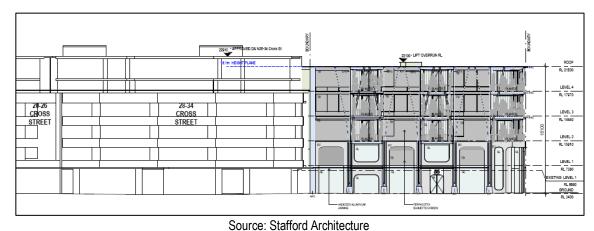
Streetscape Elevation Showing Relationship to Nos. 28-34 Cross Street
